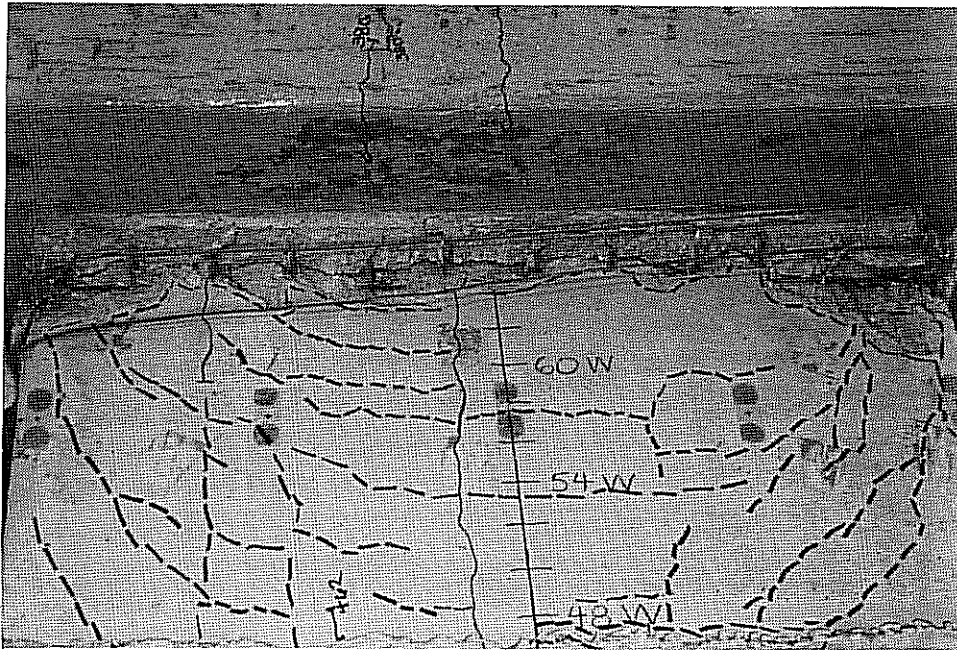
Specimen 10ML18 Compression Flange Close-Up
